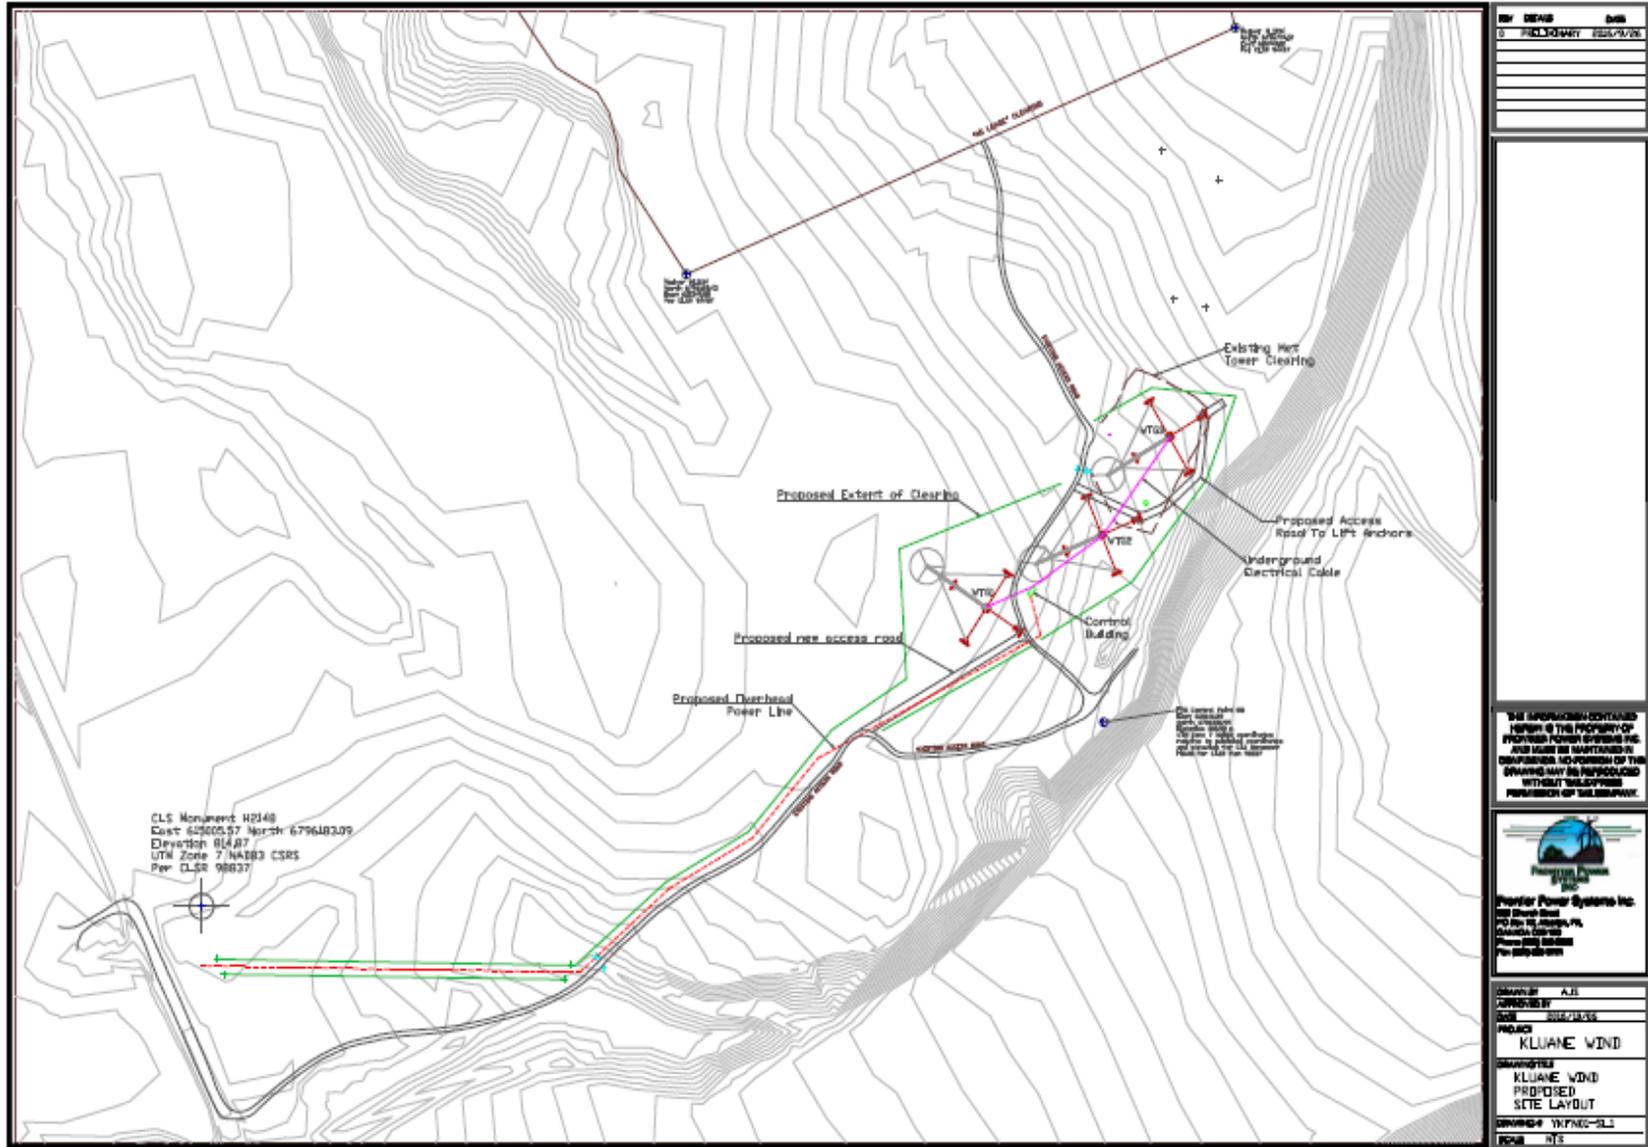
Site map and layout with new access road. Frontier Power, 2016.
